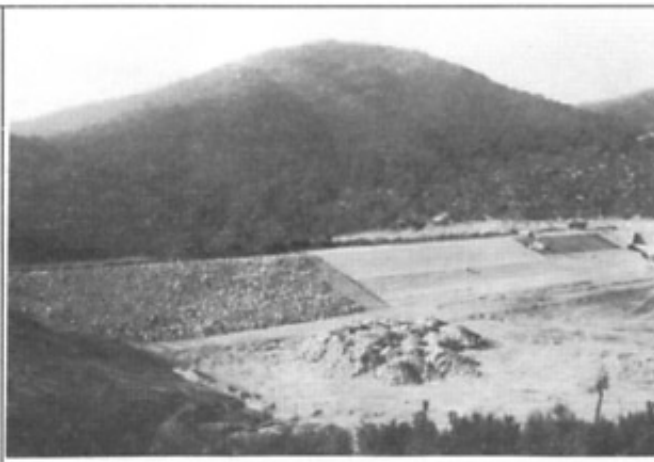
Upstream slope protection during geotextile placement in Zone C. (The rocks stockpiled in the foreground were placed in Zone C).
